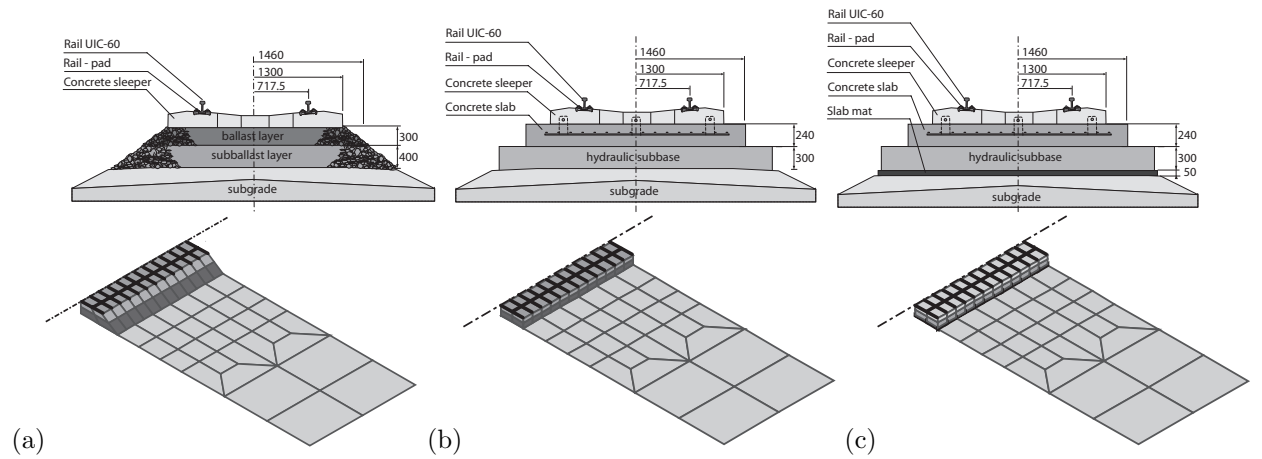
Cross section and discretization detail for: (a) ballasted track, (b) slab track and (c) floating slab track.
